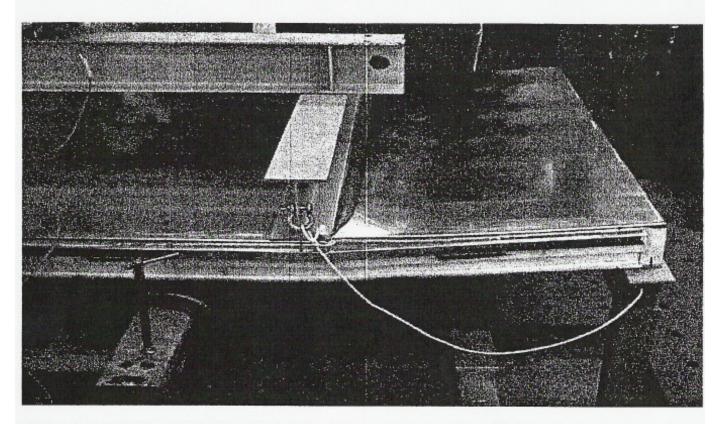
Failure of 8' Galv.-Galv. Panel Under Transverse Loading
